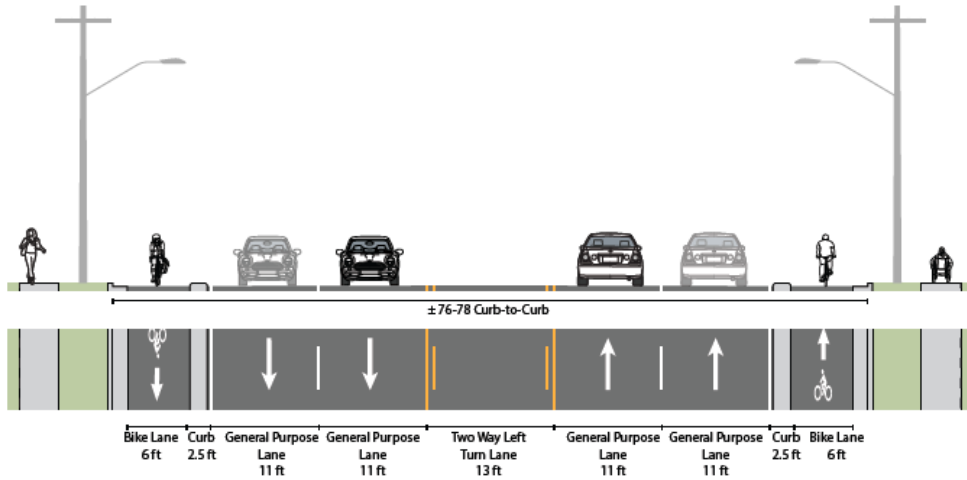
Proposed Street Cross Section for Antelope Drive (1000 W to 1000 E)
